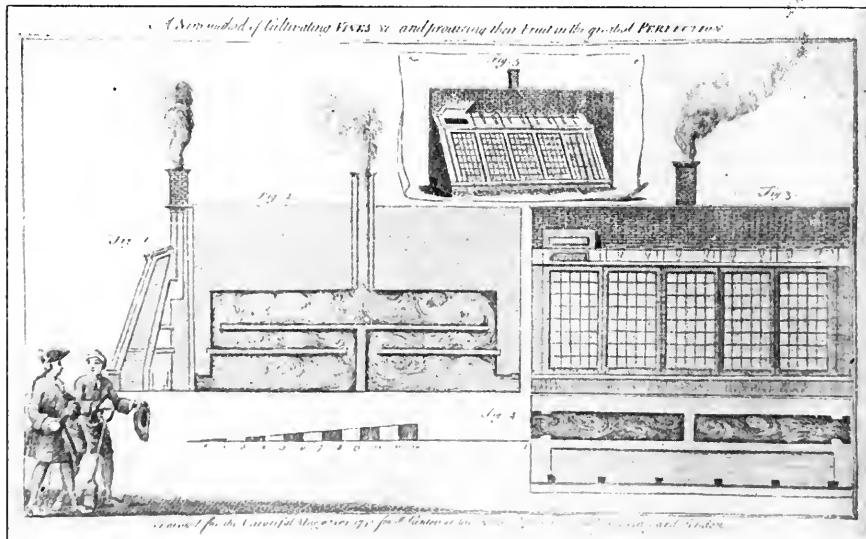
ANOTHER GREENHOUSE HEATING SYSTEM
